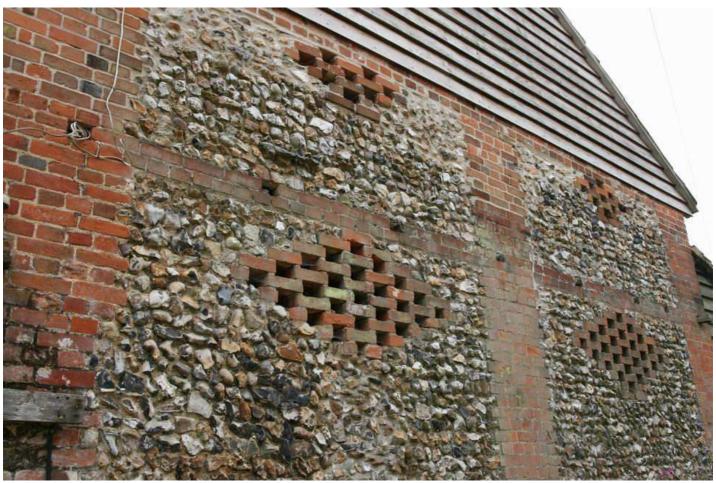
Building 1, detail of ventilation panels, NE elevation
